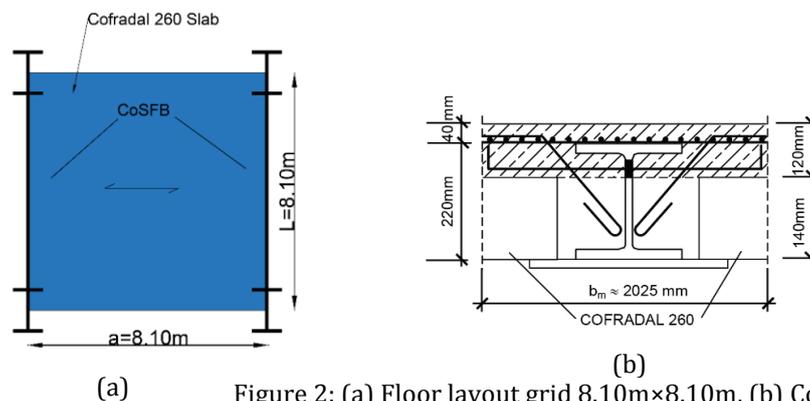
(a) Floor layout grid 8.10m×8.10m, (b) CoSFB with Cofradal 260mm flooring system section (Braun et al., 2011)
